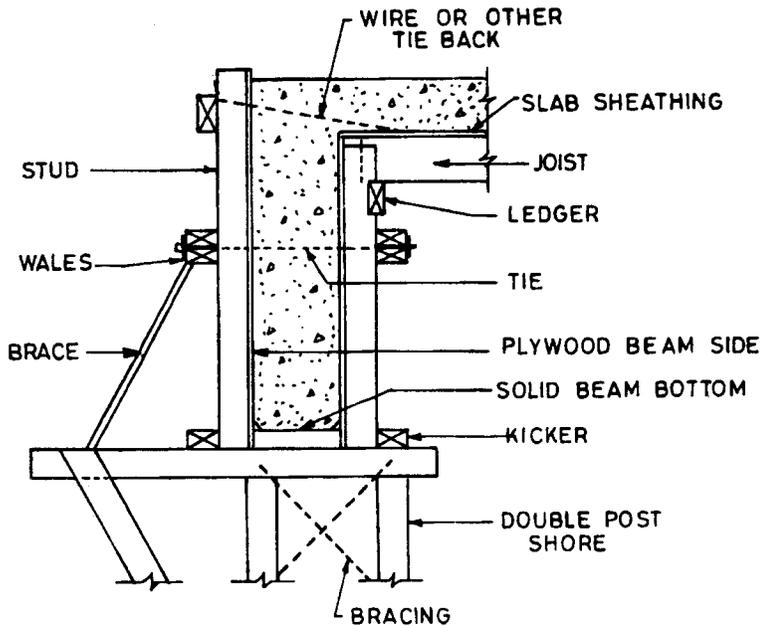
TYPICAL STUD AND WALE FORMING FOR A SPANDREL BEAM WITH BRACING
